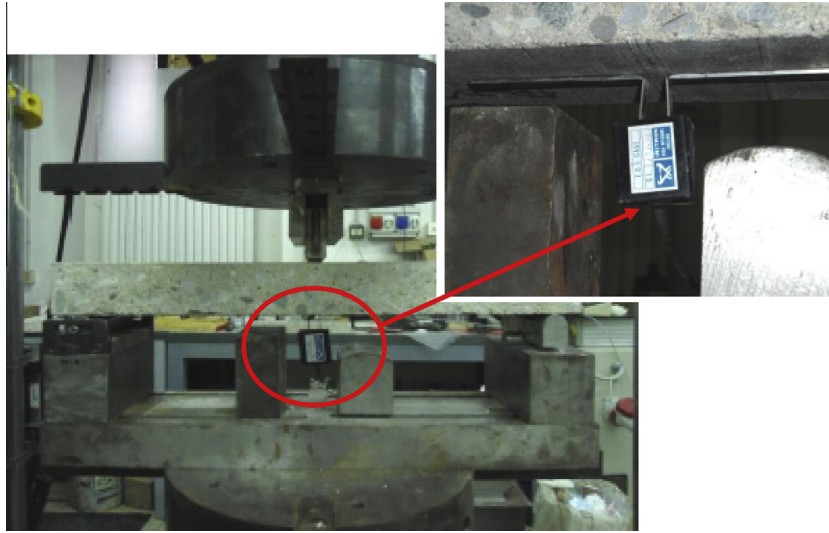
3-Point bending test set-up for specimen pre-cracking (beam span = 450 mm).
